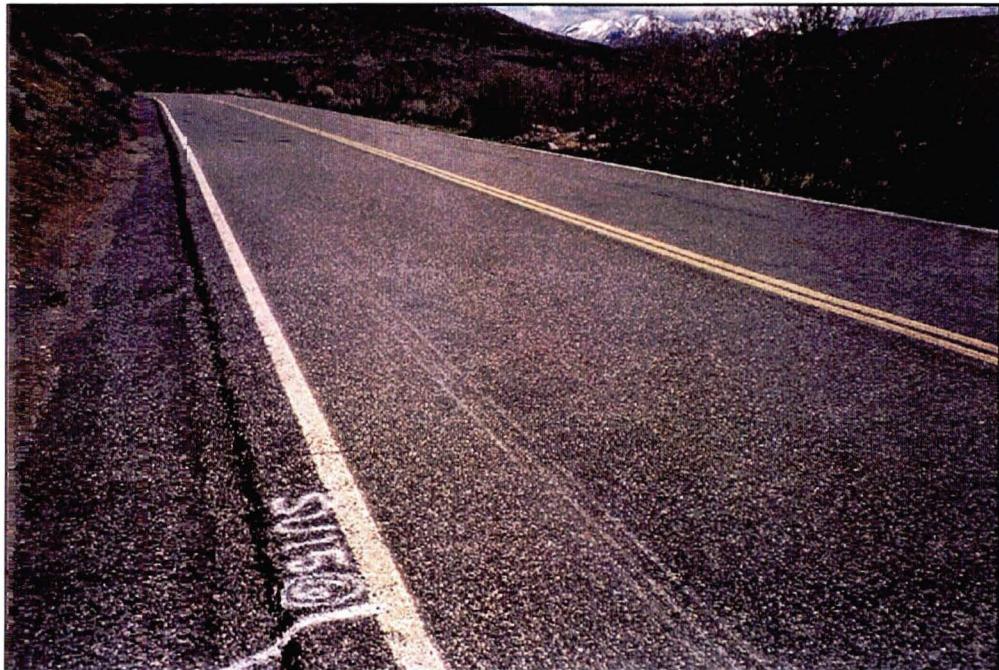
Section 6, Sample Unit 15 (MP 5.01)
